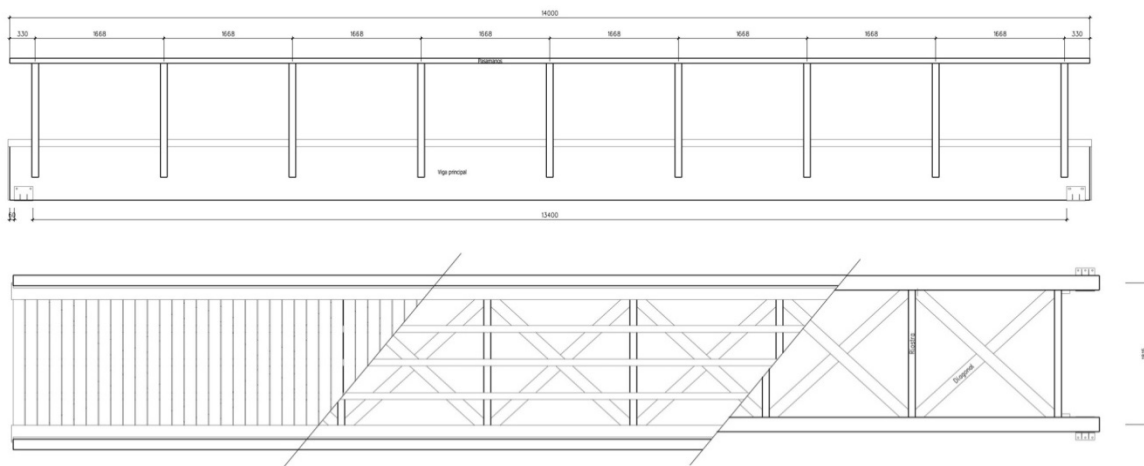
Manufacturing plan 14 meters span and 2 meters width simply-supported beam bridge
